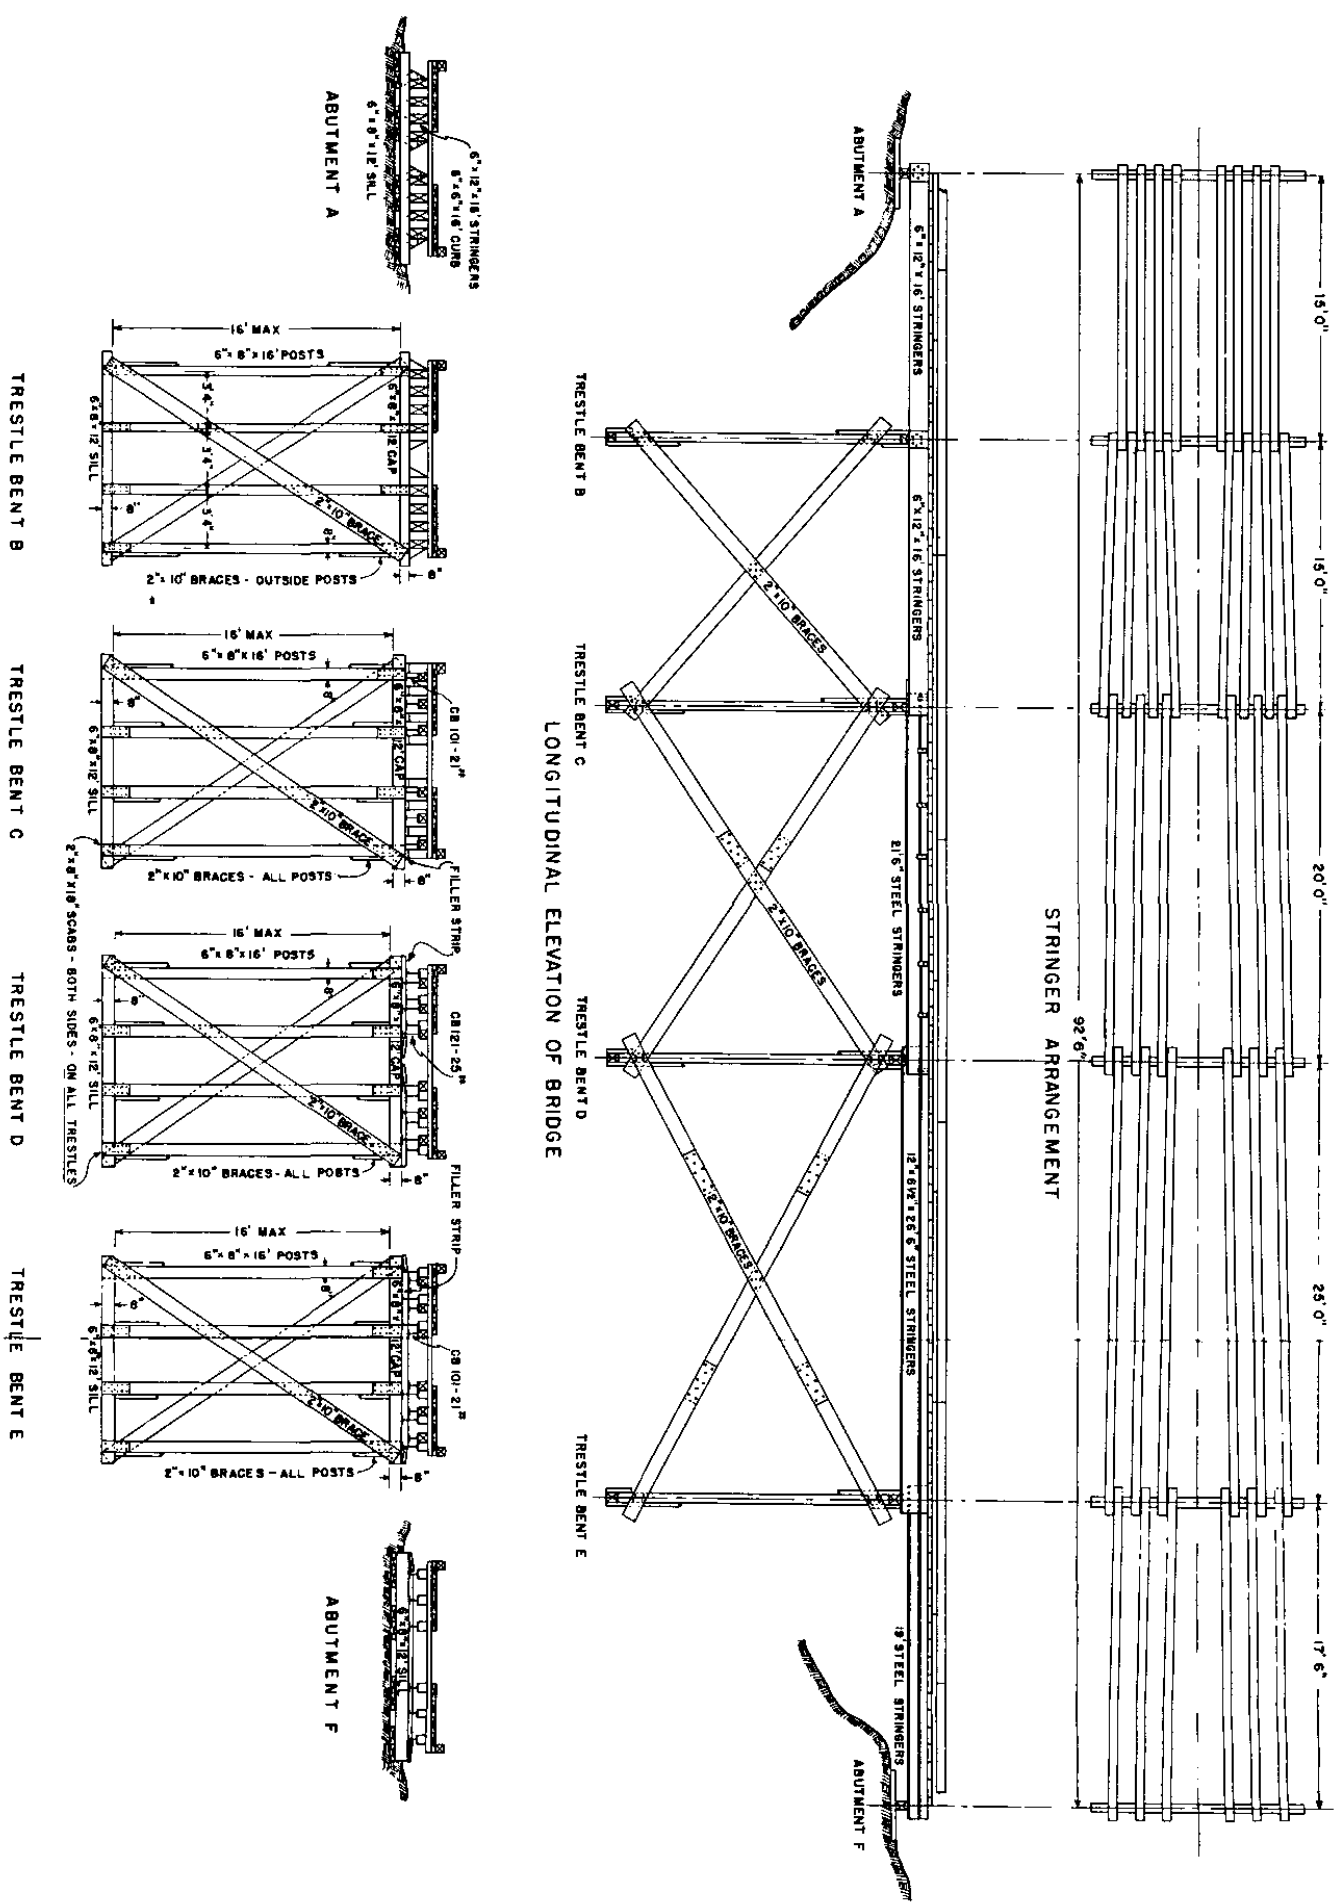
Multiple short span (nonfloating) bridge for corps and army loads (H-15 loading). Main trestle members 6- by 8-inch timbers, used with steel stringers in spans up to 25 feet.
